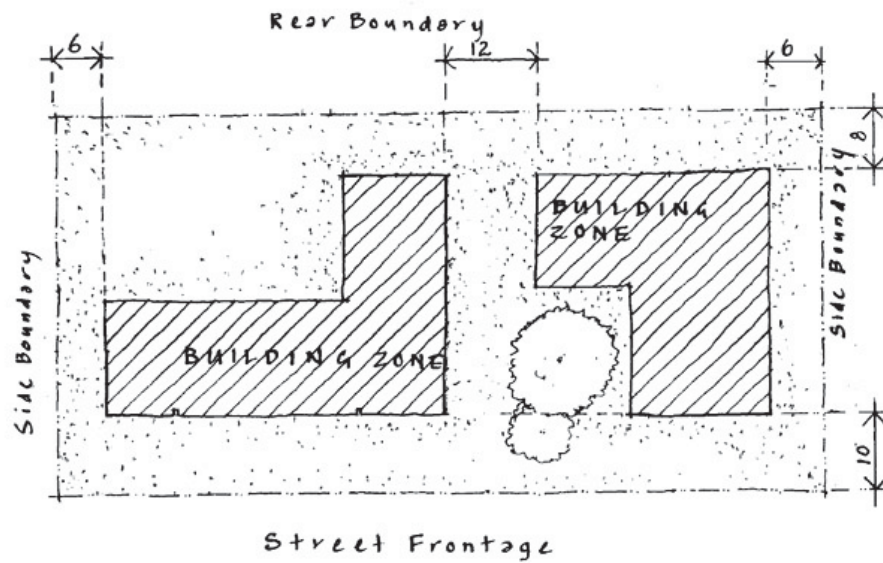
Ground Floor Building Zone Setbacks – One Street Frontage
